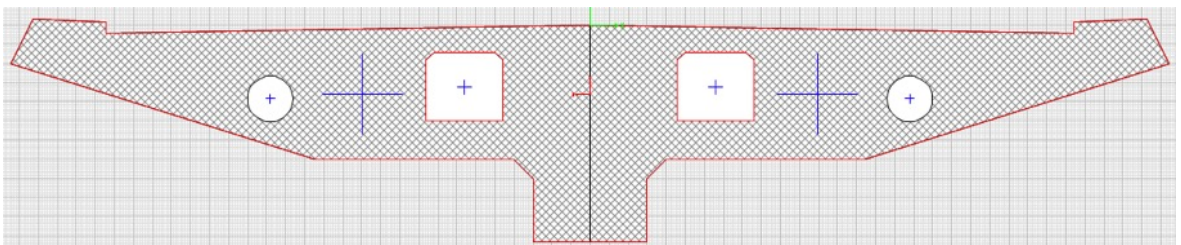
Cross-section detail of abutment-5 in FEM.
